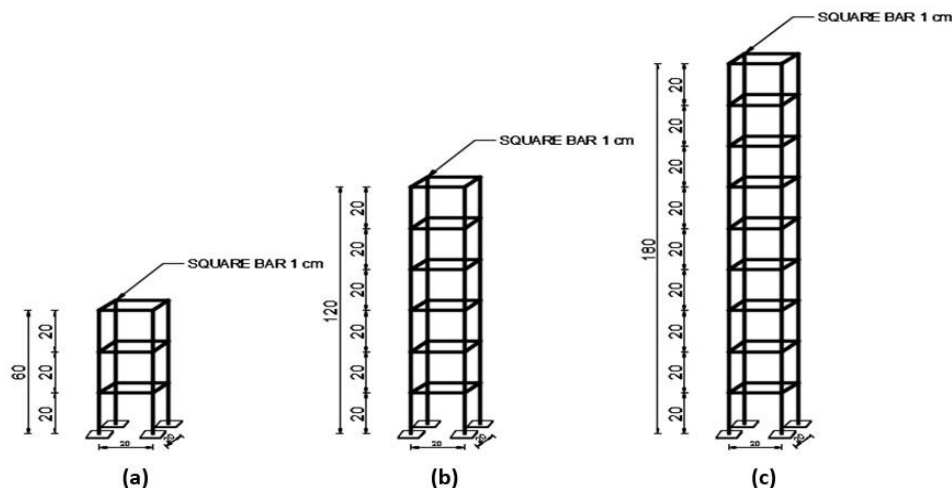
Steel frame structures: (a) Low rise building, (b) Medium rise building, and (c) High rise building.
